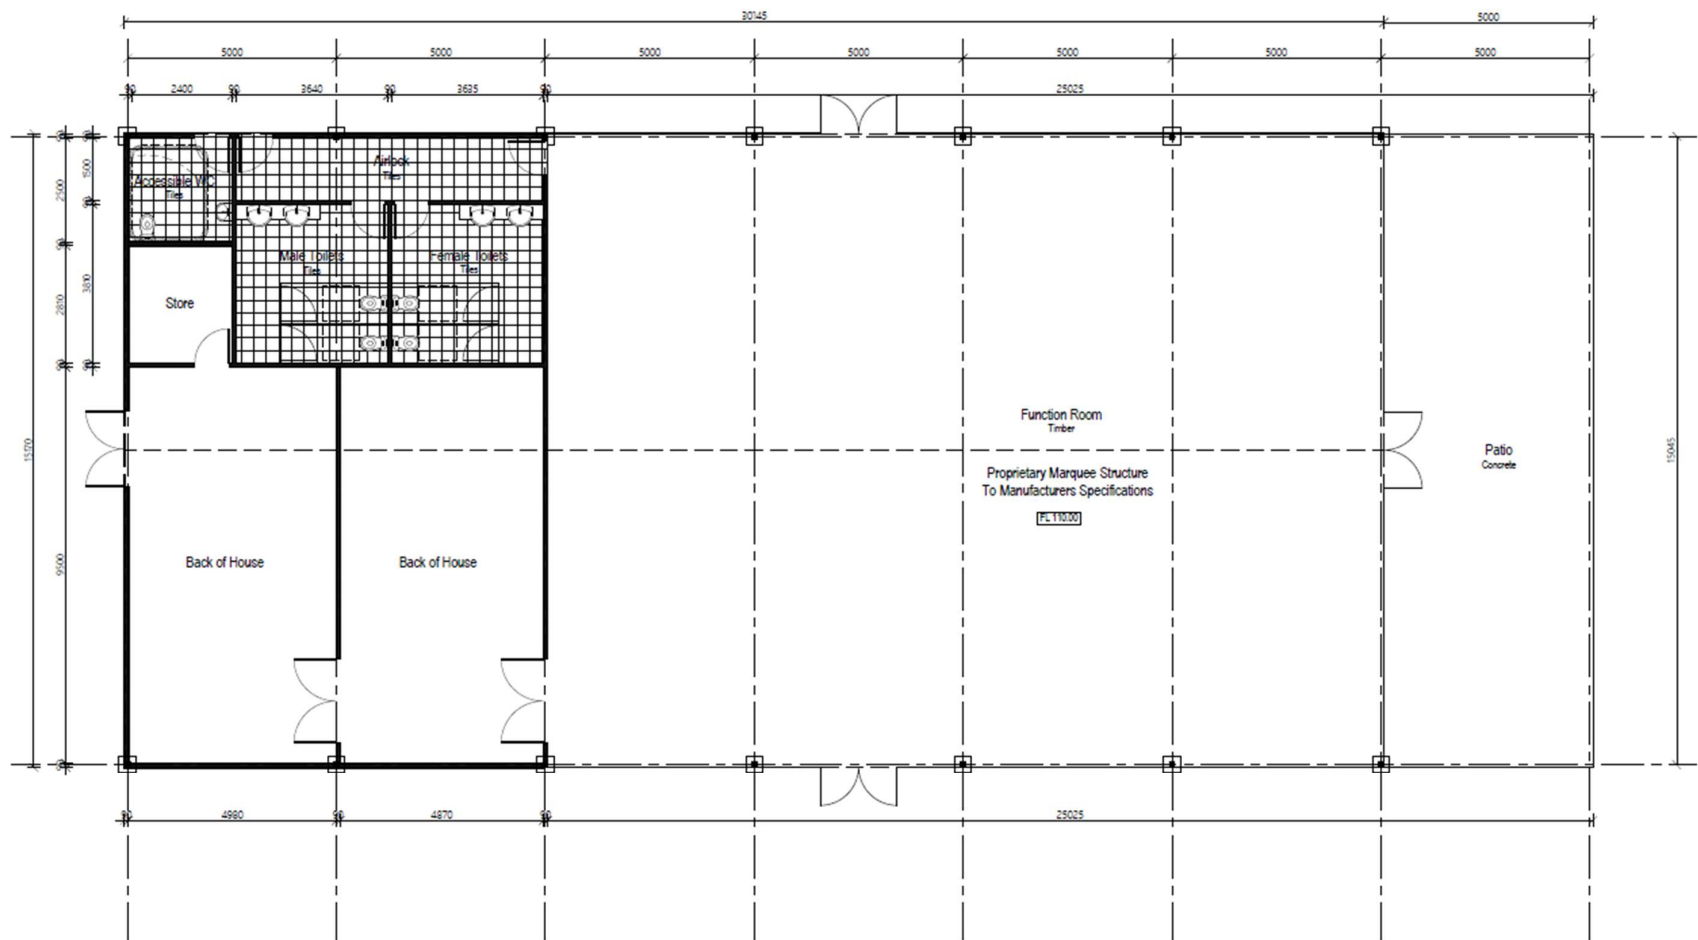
Proposed first floor plan (Source: CAD Design & Draft Pty Ltd, 2023)
